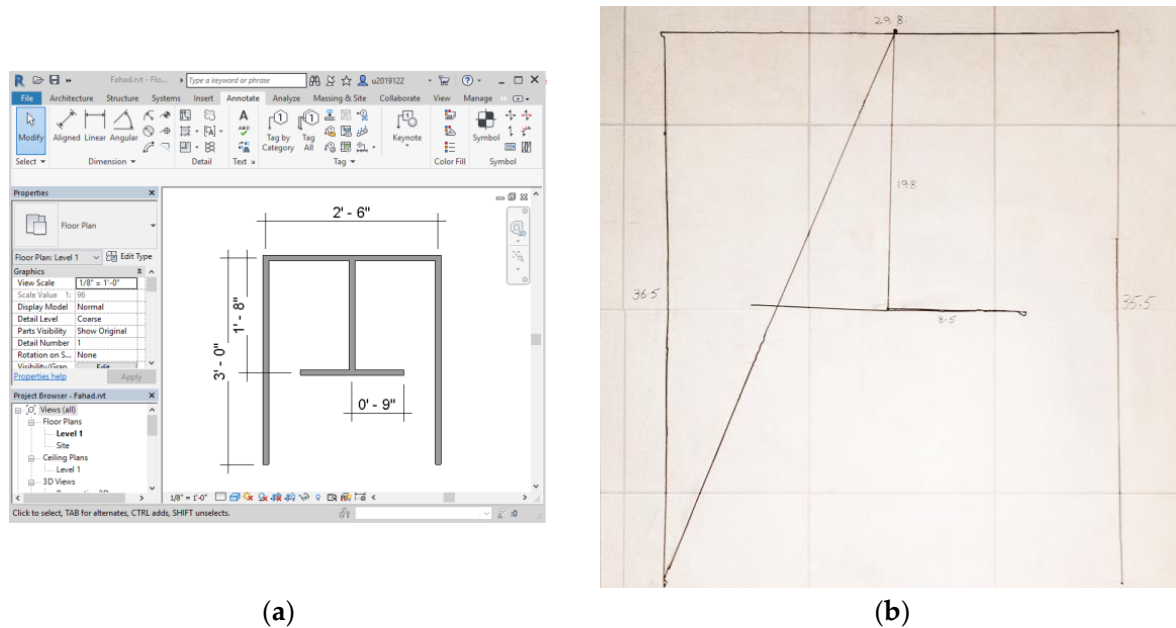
(a) Floor plan model in Revit. (b) Layout of the drawing printer by the robot.
